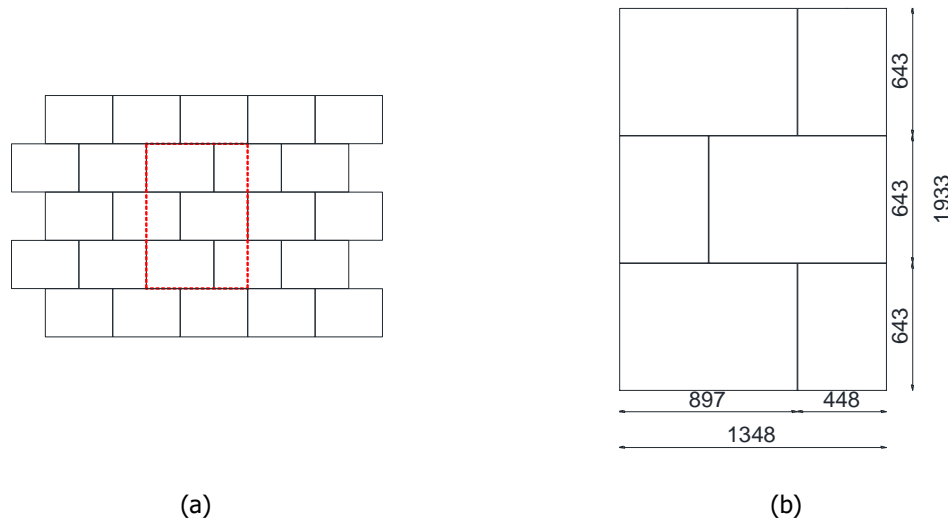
Vertical out-of-plane bending test (OOP1): (a) tested portion; (b) dimensions of the specimen.
